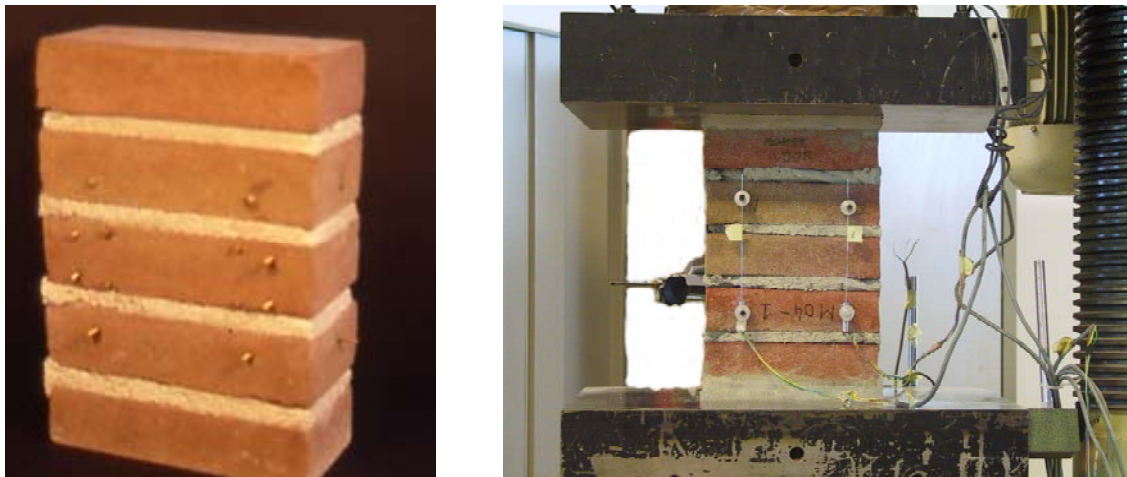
Stack bonded specimen of series A showing LVDT positions and specimen in 2.5 MN Schenck testing machine.
